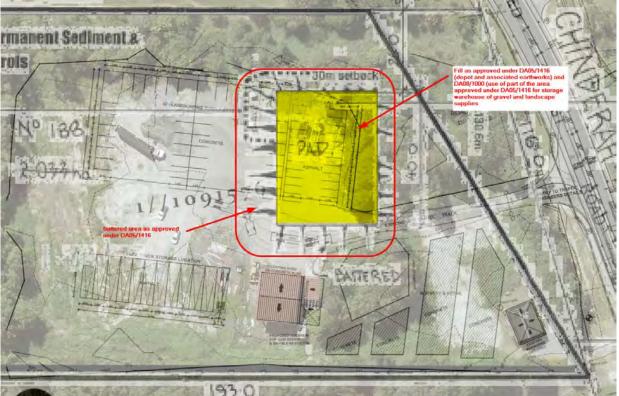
2018 aerial imagery, with DA05/1416 plan and current proposed plan overlayed (source: TSC GIS, weave, file for DA05/1416 and extract from submitted plans under the subject application)
